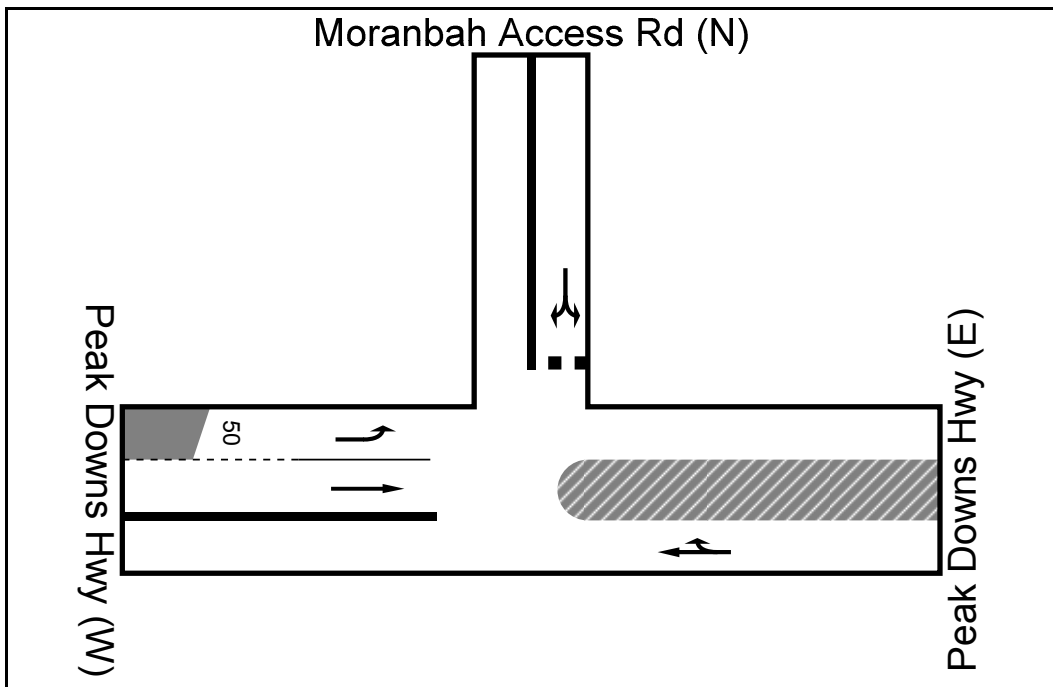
Moranbah Access Road/Peak Downs Highway (Existing Intersection Layout)
